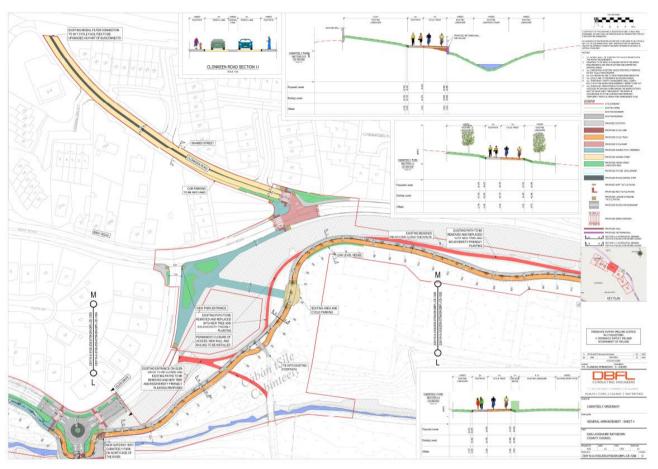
Proposed Section C(1) of Cabinteely Greenway (Source: DBFL Consulting Engineers)
